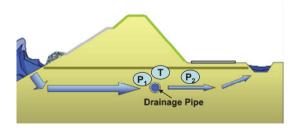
Zeeland dike cross-section with approximate sensor positions and arrows showing the piping direction. Excess water is pumped out through the drainage pipe to prevent piping.
